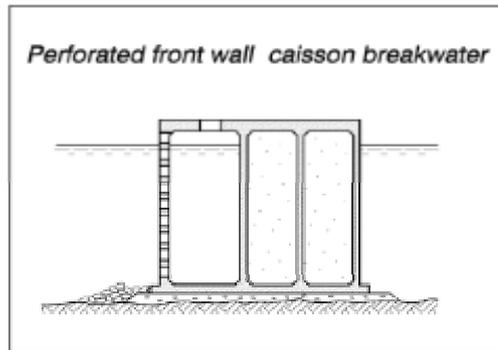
Cross-section of Perforated Front Wall Caisson Breakwater (CEM, 2003)
